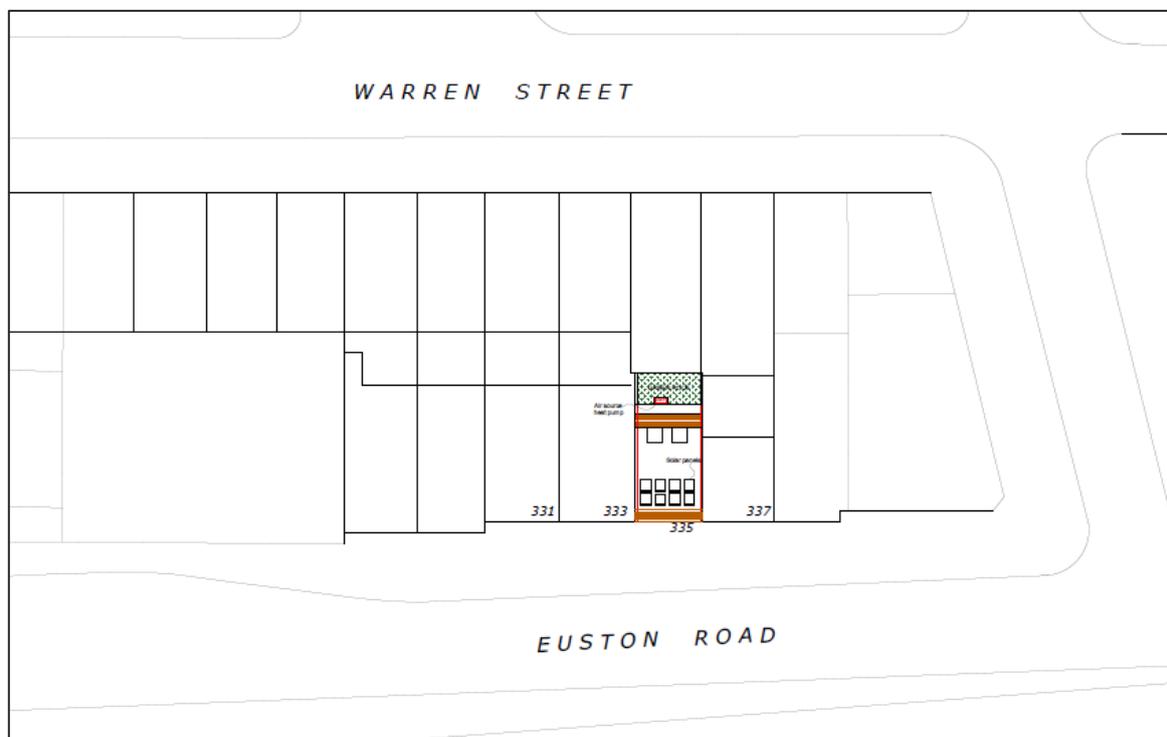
Proposed site plan (The Gillett Macleod Partnership)
